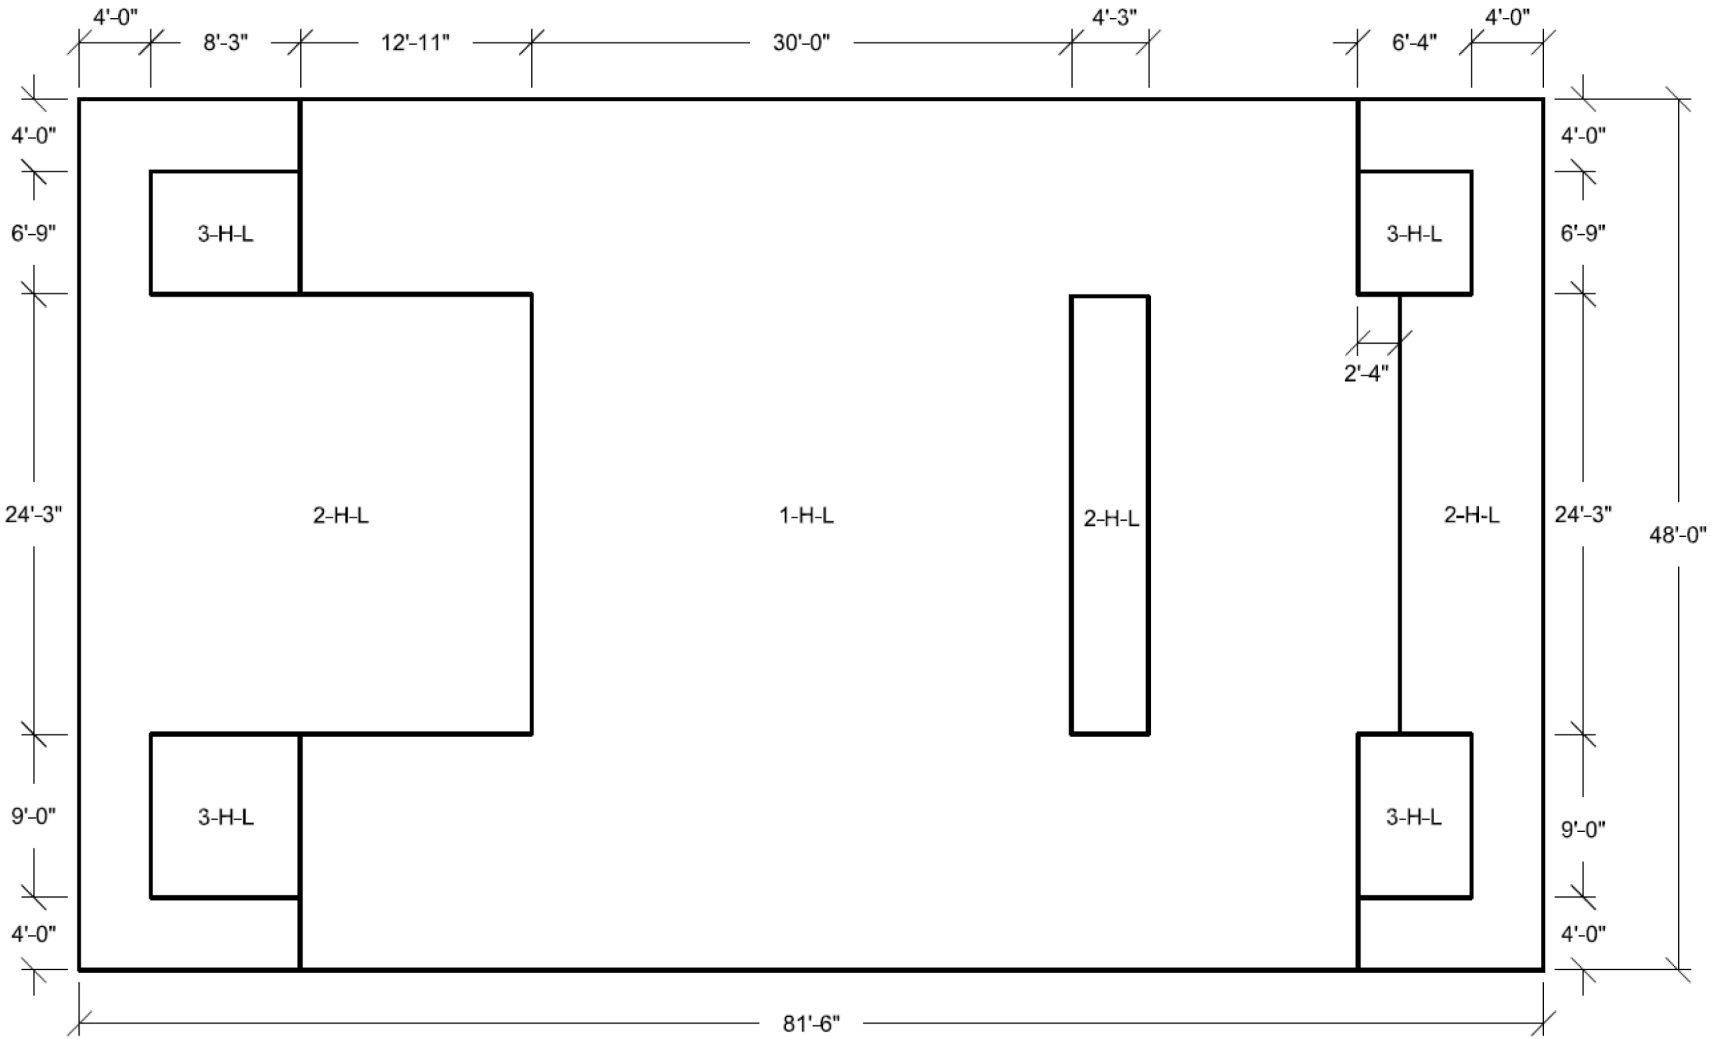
H.6-142 DGFOV Slab 1 Looking Down
